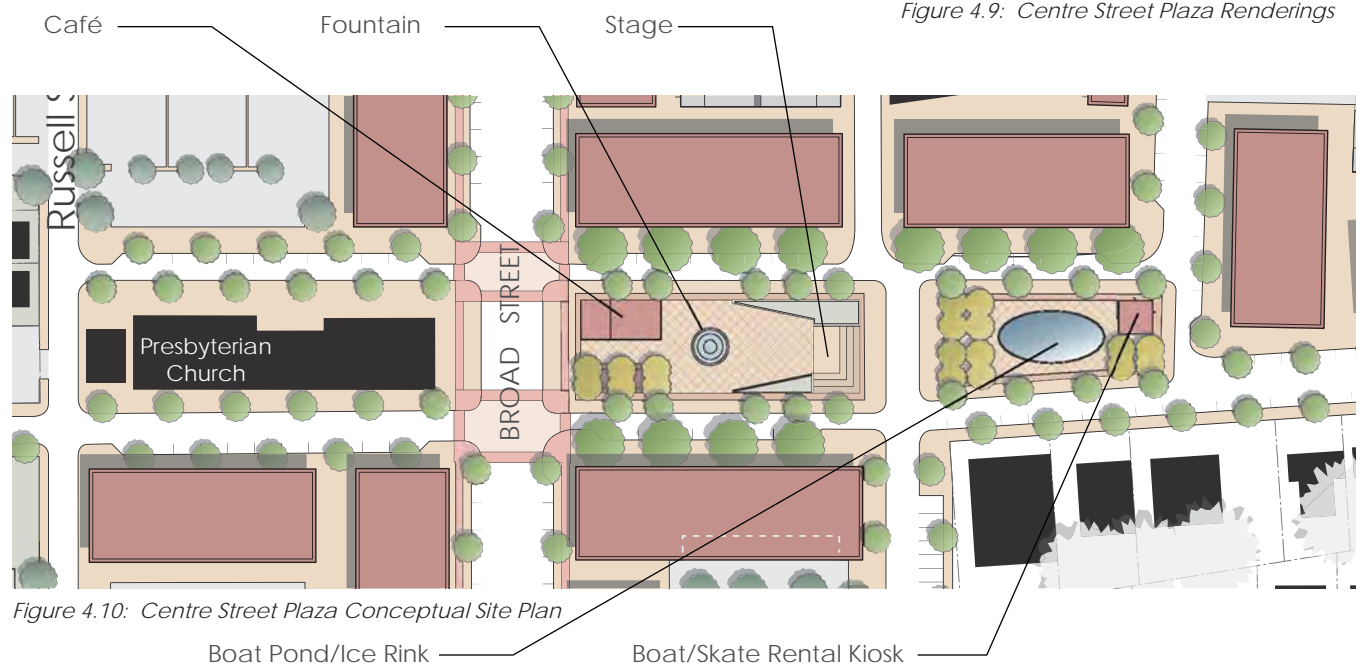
Centre Street Plaza Conceptual Site Plan
